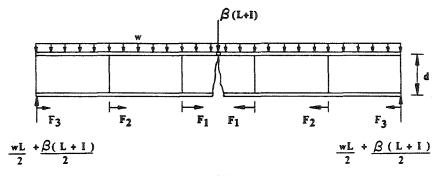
Elevation View of Fractured Girder as a Free Body
